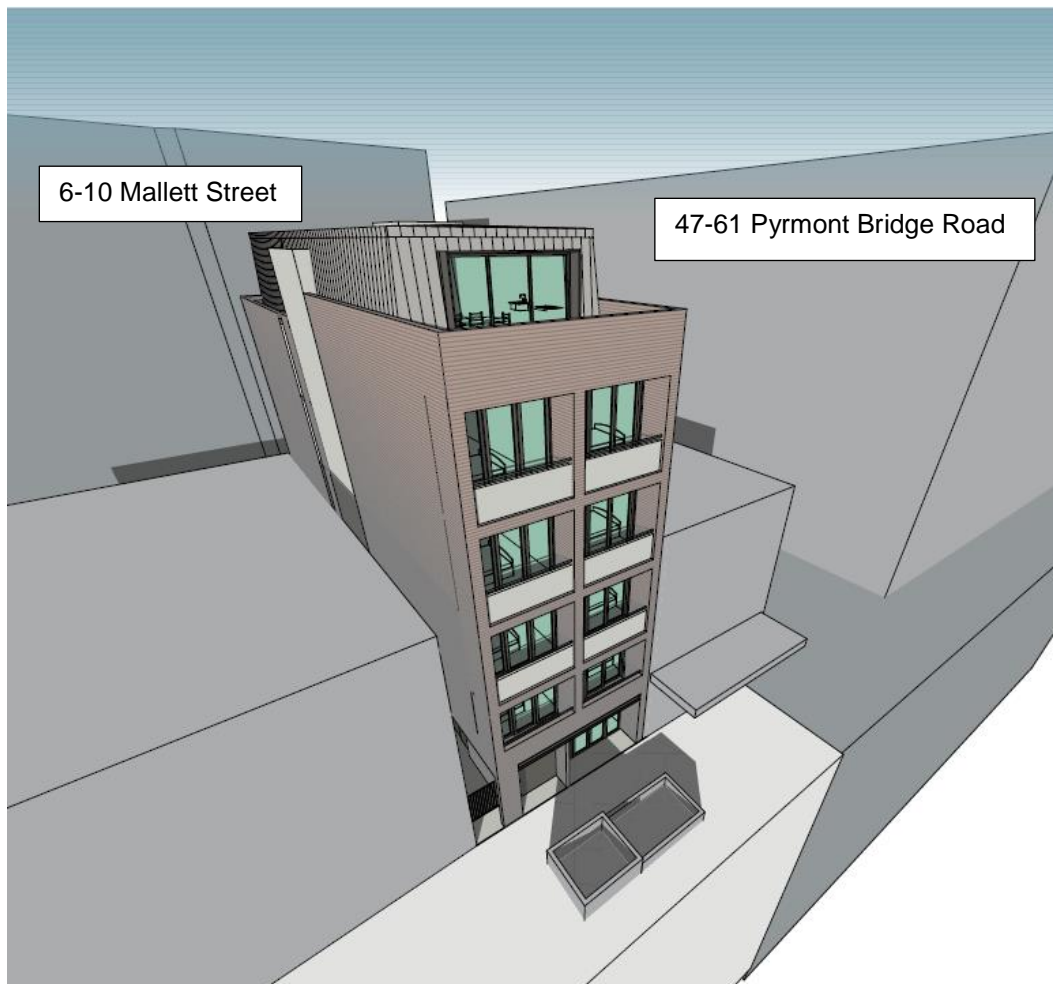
Massing plan illustrating that the proposed building form will fall within the context of development located to the west and north
